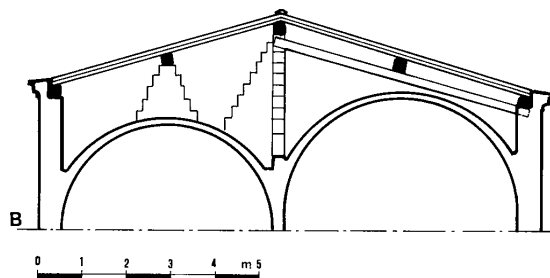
Typical section of a wooden saddle roof (Randazzo, 1988).
